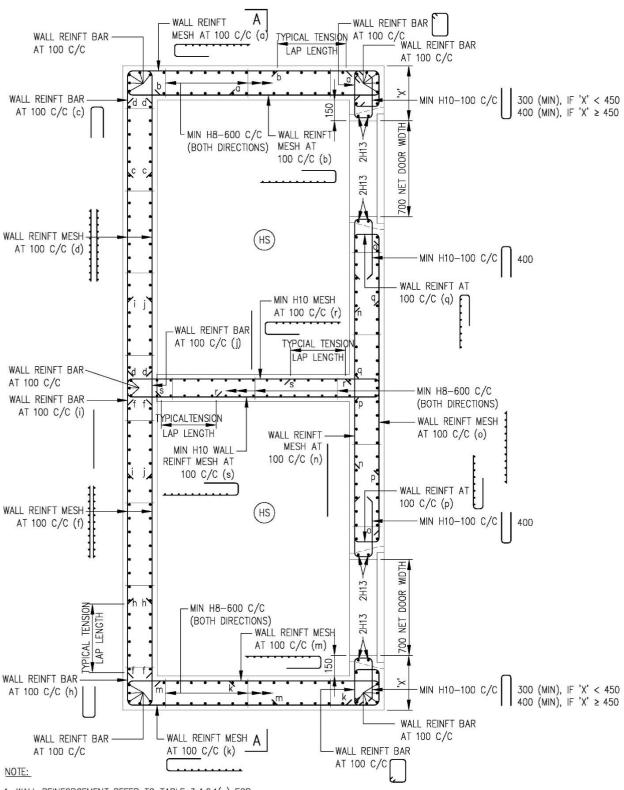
(c) SECTIONAL DETAILS OF HS SLABS/WALLS
